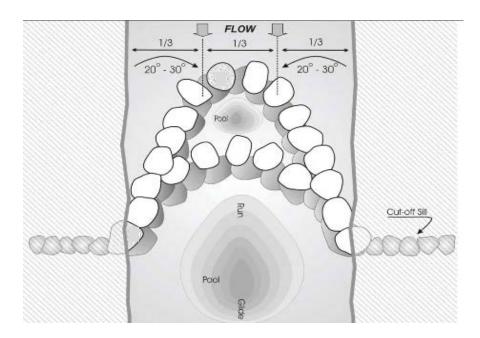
Plan View of Rock Step (Rosgen, 2006).
